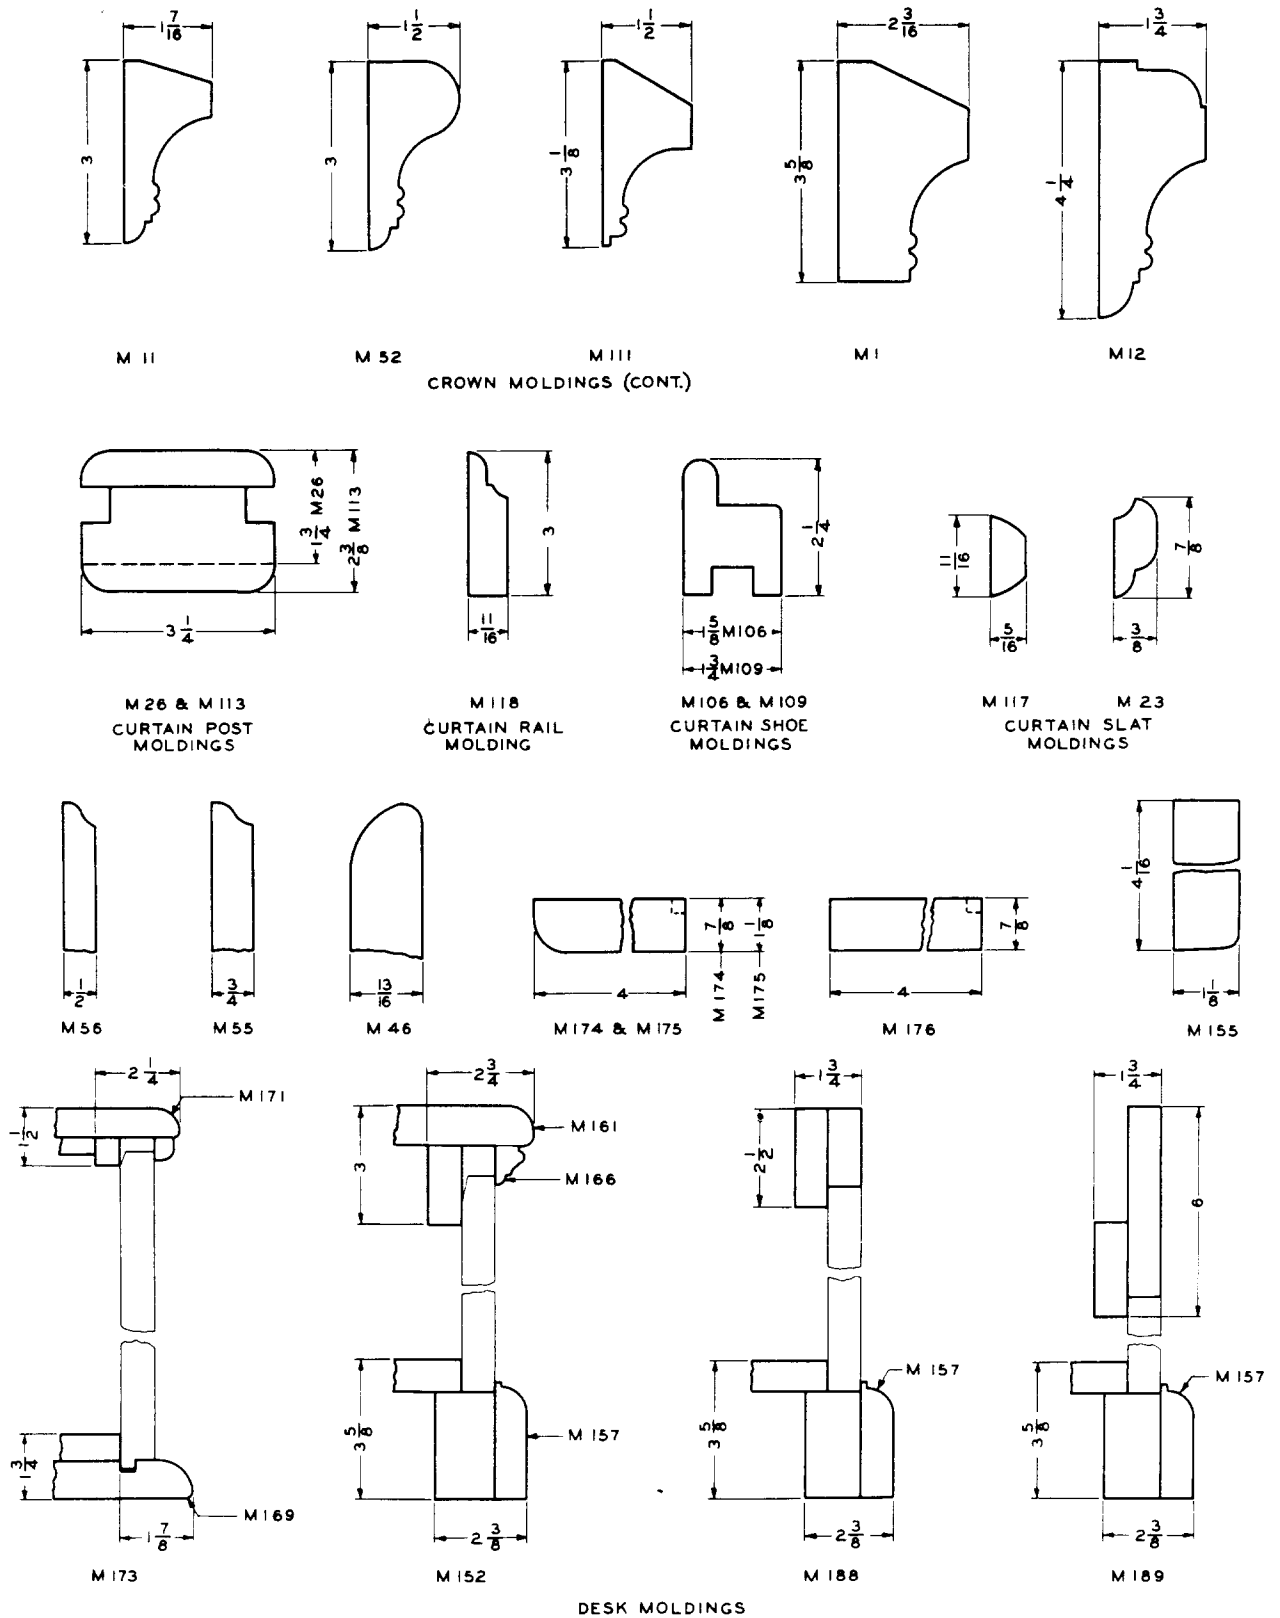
Curtain, Large Desk, and Large Crown Moldings
